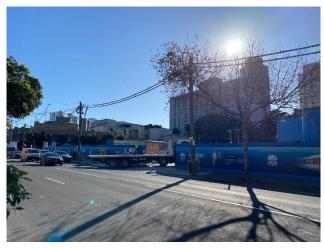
South western corner of site, located at the corner Wellington Street and Botany Road
